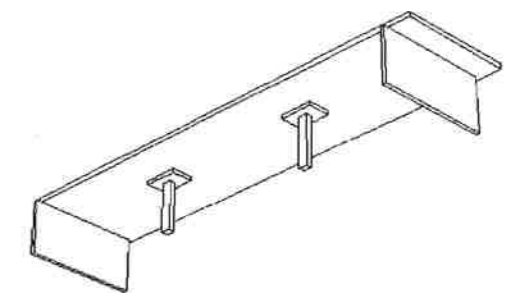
3D View of the Design Strip (P389)
